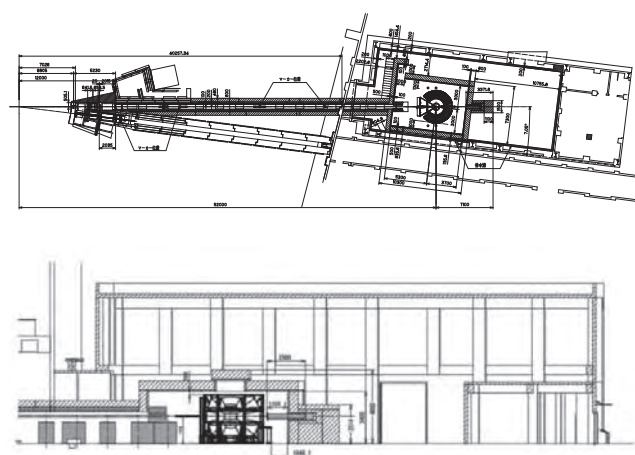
The ground plan of BL09 and the cross-section drawing of the experiment building for SPICA.
